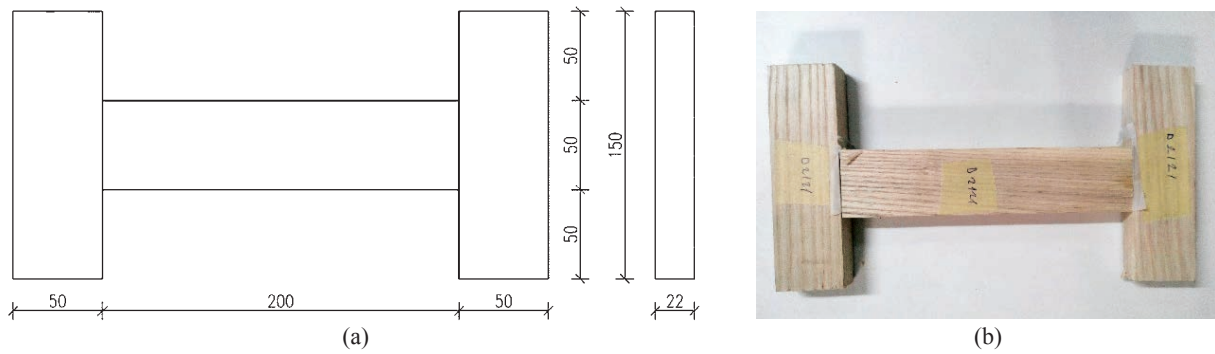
Test specimen dimensions (a) and real picture (b) (dimensions in mm)
